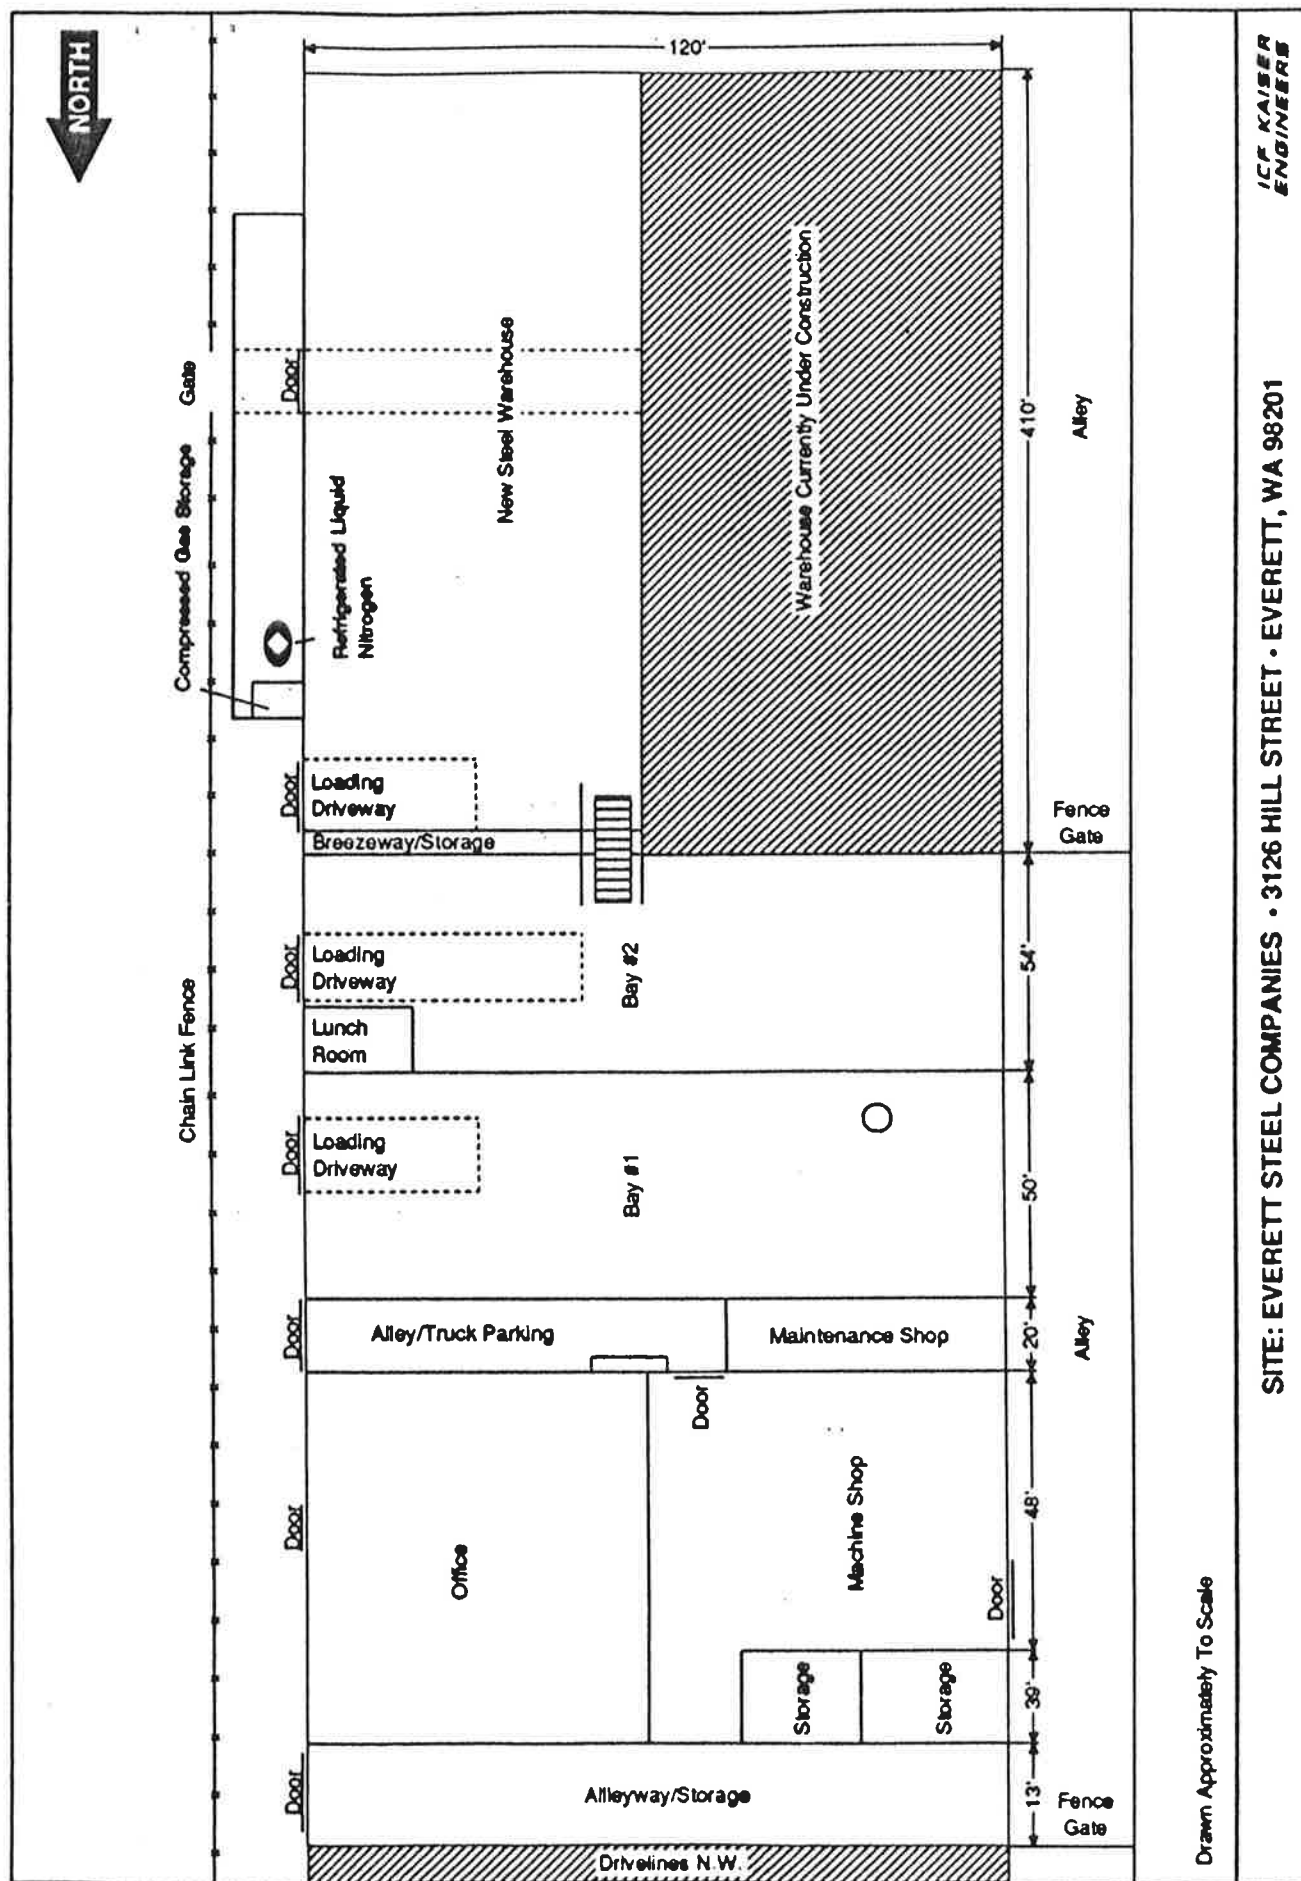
SITE PLAN OF WAREHOUSE AREA
